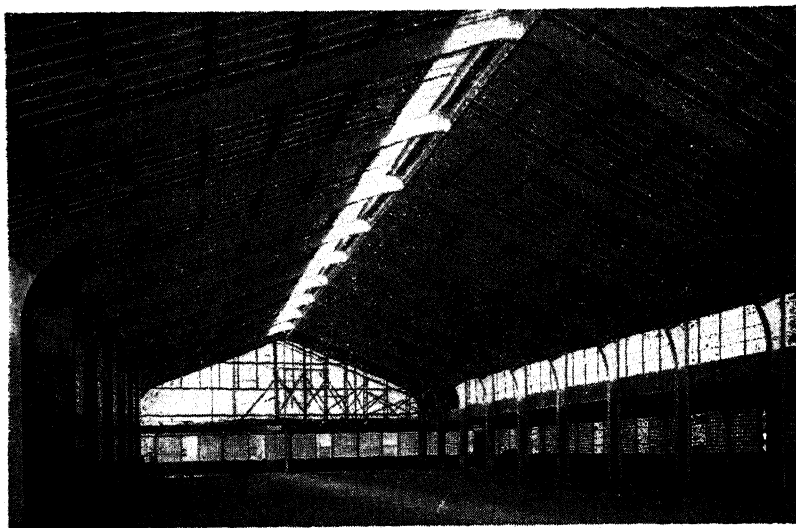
One of the larger rooms in the second story of the building shown in Fig. 1086, showing clear head room between floor and ceiling afforded by the beam type construction.
